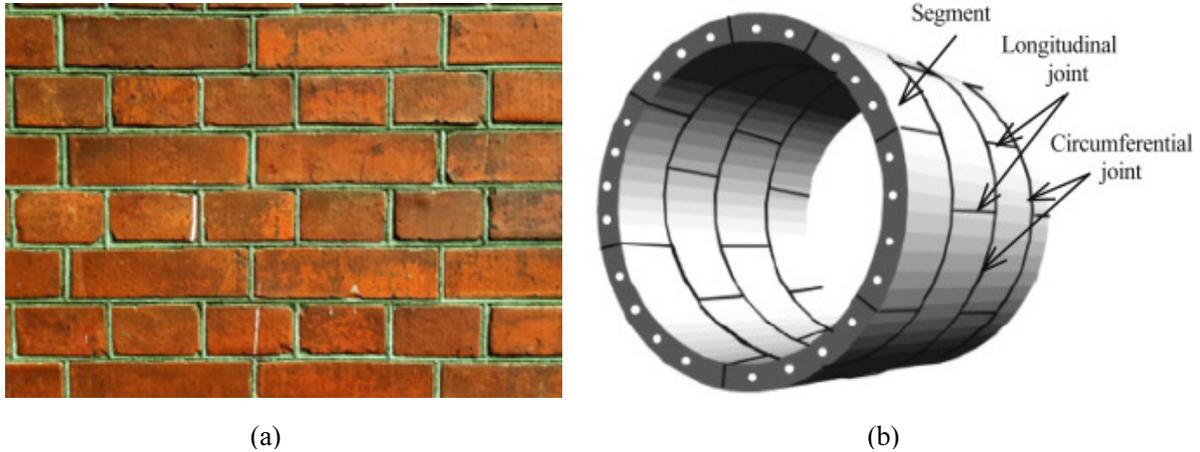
Stacking of clogged joints (a) brickworks, and (b) segment assembly
